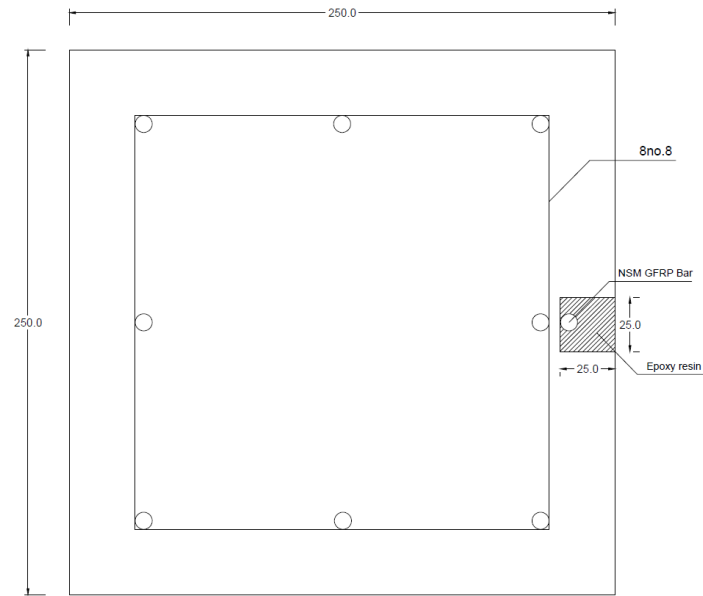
Schematic Drawing of the (NSM-GFRP) bar in the column cross section
